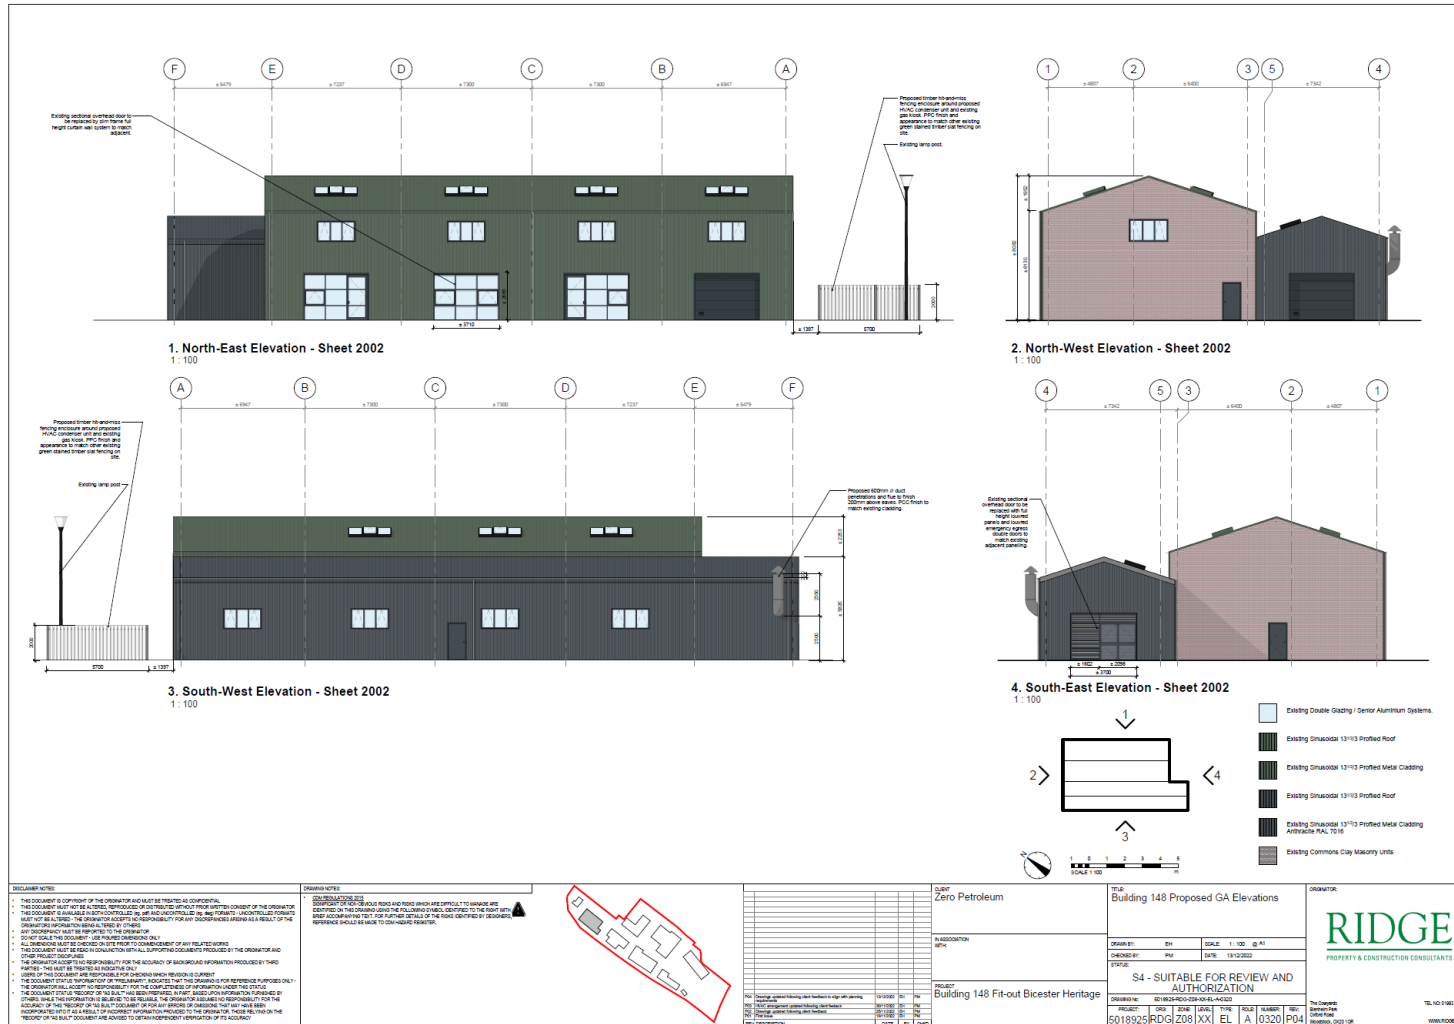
Site Plans Provided by 'Ridge Property & Construction Consultants'
